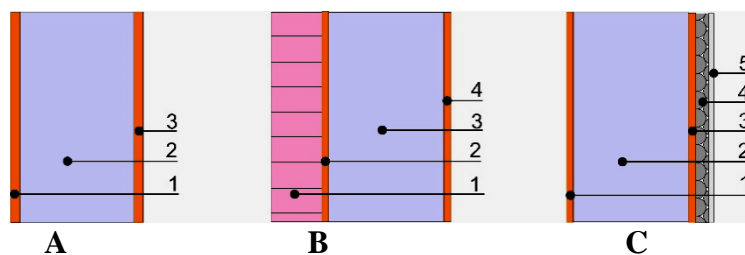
Montastan façade panel types, compositions: A - single-layer façade panel: 1. Cement mortar 1.5 cm; 2. Clay block 27 cm; 3. Lime mortar 1.5 cm; B – façade panel enclosed by face brick: 1. Face brick 12 cm, 2. Cement mortar 1.5 cm, 3. Clay block 27 cm, 4. Lime mortar 1.5 cm; C – Façade panel with internal thermal insulation and gypsum board: 1. Cement mortar 1.5 cm, 2. Clay block 27 cm, 3. Lime mortar 1.5 cm, 4. EPS 2 cm, 5. Gypsum board 1 cm.
